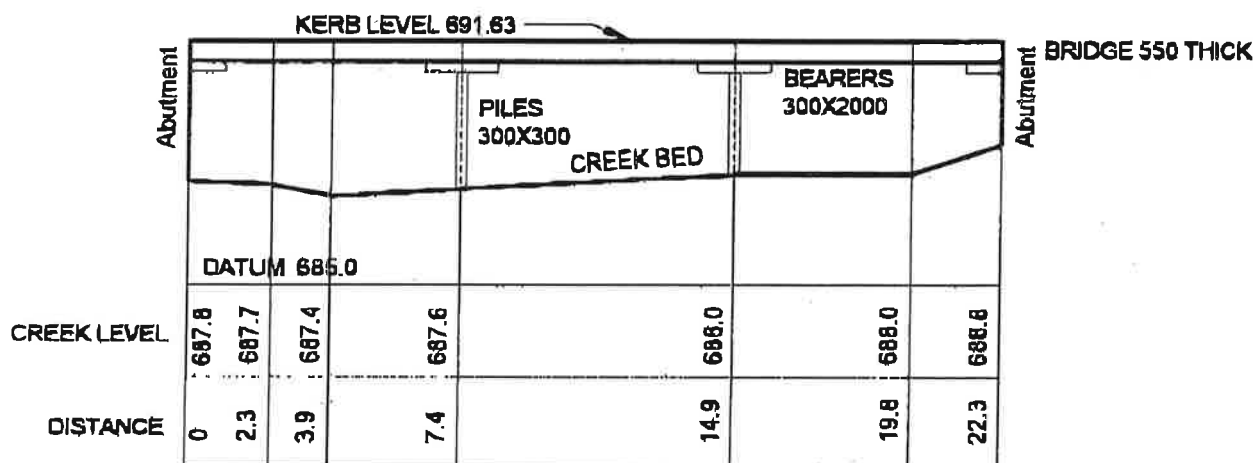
DETAILS OF BRIDGE CROSSINGS OF TURALLO AND HALFWAY CREEKS
